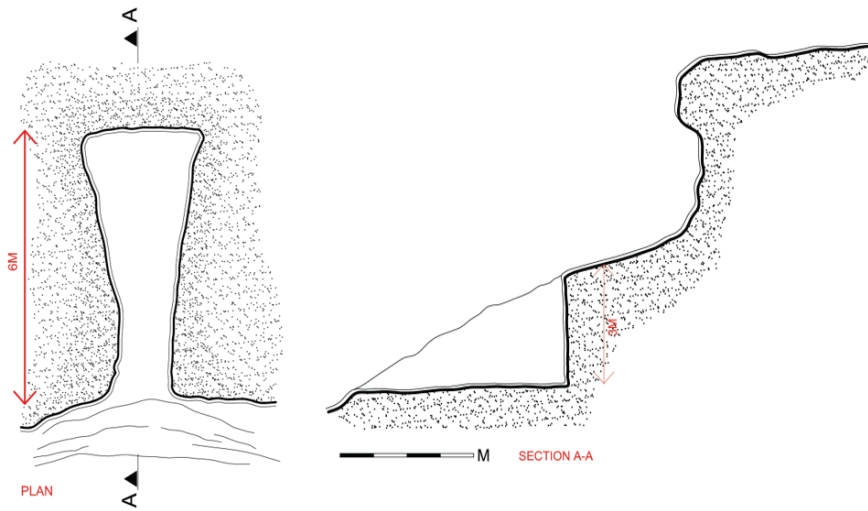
The first stage of excavation (excavation of entrance trench, i.e., Kicheh) in cross-section and plan view.
